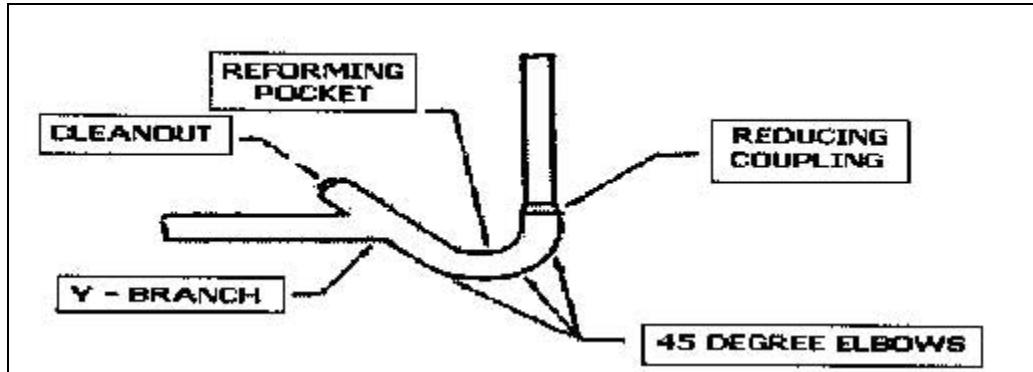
HORIZONTAL TO VERTICAL DROP CONNECTION
